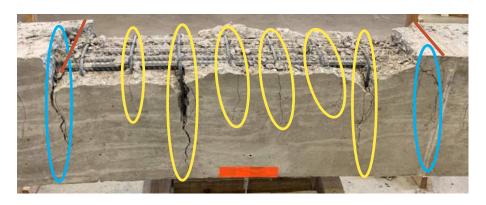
Shear Span – Late Testing (C3/60-40-5-200)
